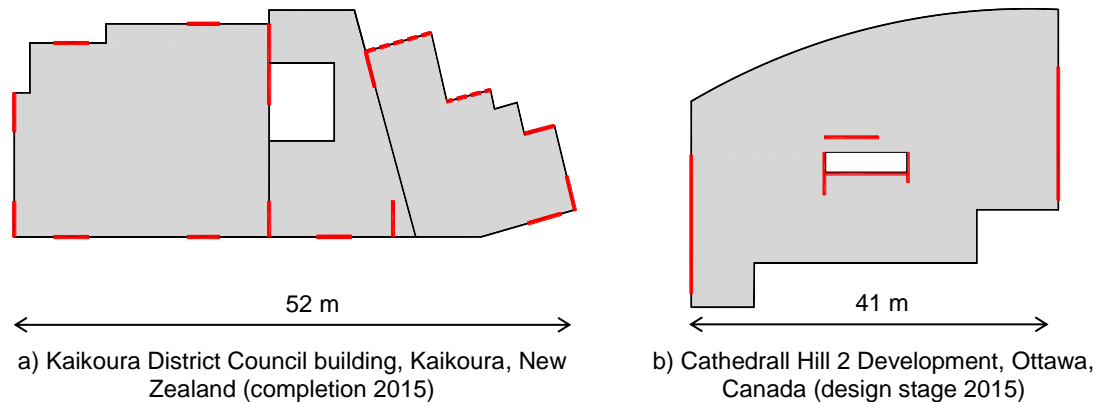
Floor layouts of recently built or planned buildings (LLRS in red)
